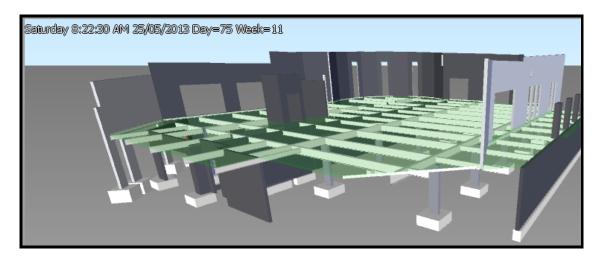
Building Approval Stage (Viewpoint 2) - Works Complete Week 11
